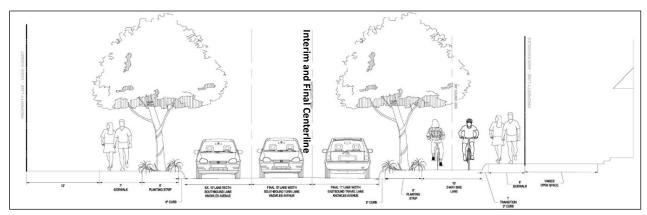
Road Section for Knowles Avenue – Final Future Conditions
